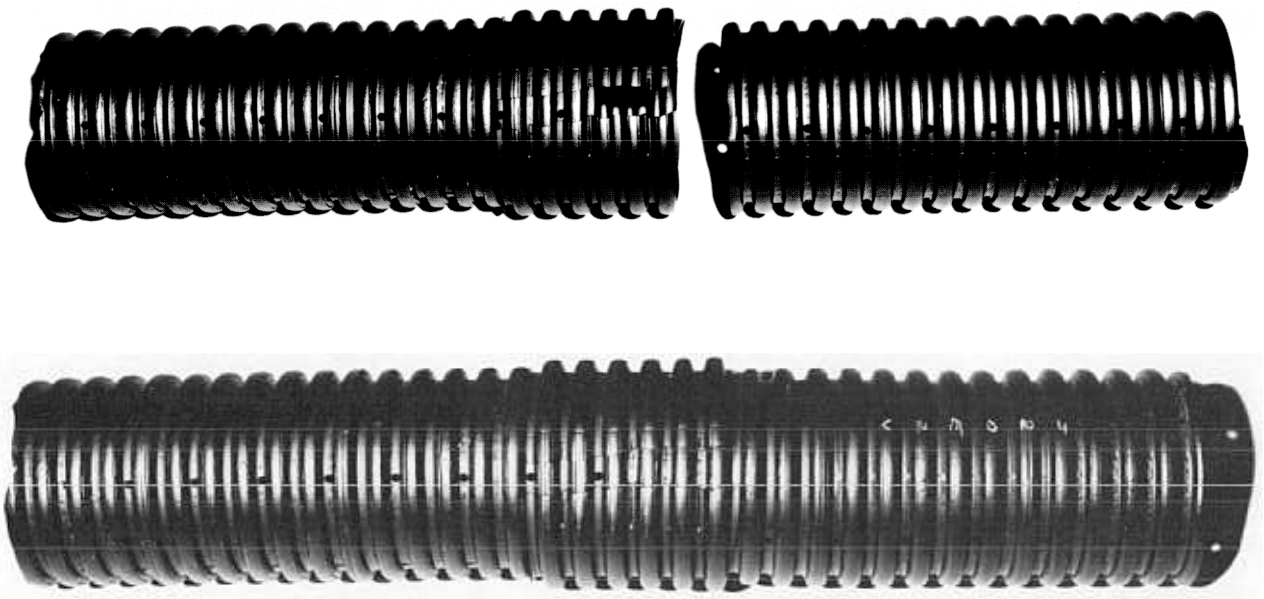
Typical pipe and joint sections for corrugated plastic pipe drains. Two lengths of pipe are shown joined together by a joint section. Drawing P801-D-77015
